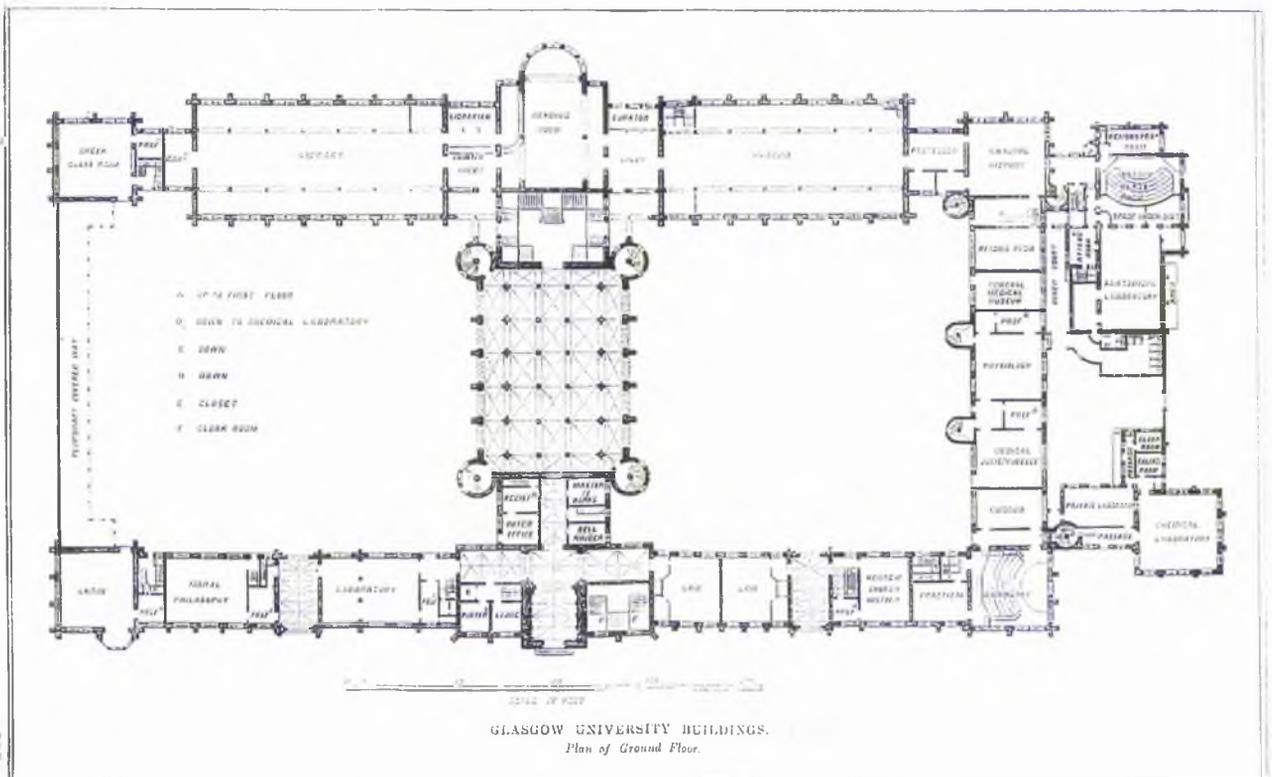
Glasgow University ground floor plan published 3rd December 1870
